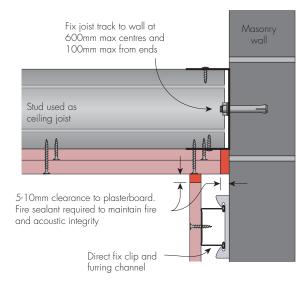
Non-Trafficable Ceiling to Masonry Wall
